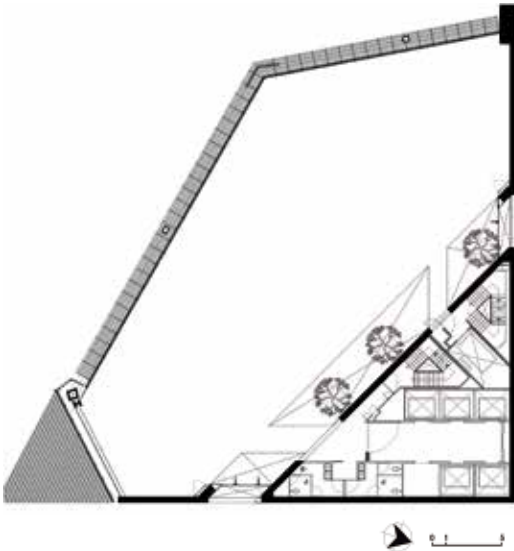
A plan view of Level 41 at Torre Reforma. The north and east façades comprise perforated reinforced concrete shear walls
